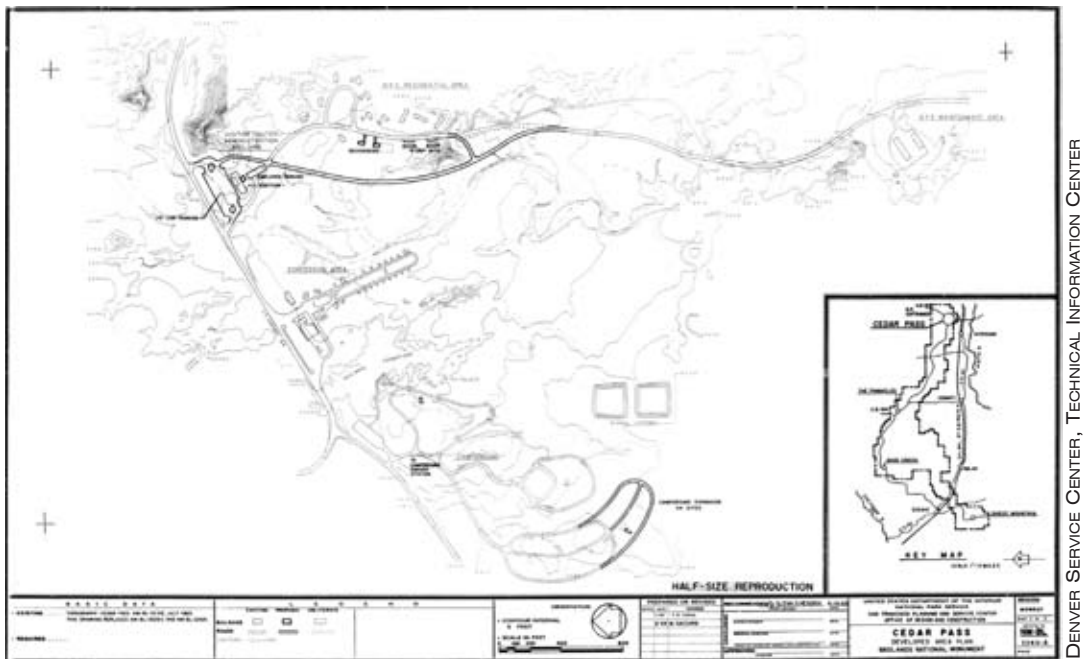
Road alignment and campground expansion plan, 1969. (DSC-3243-A)
